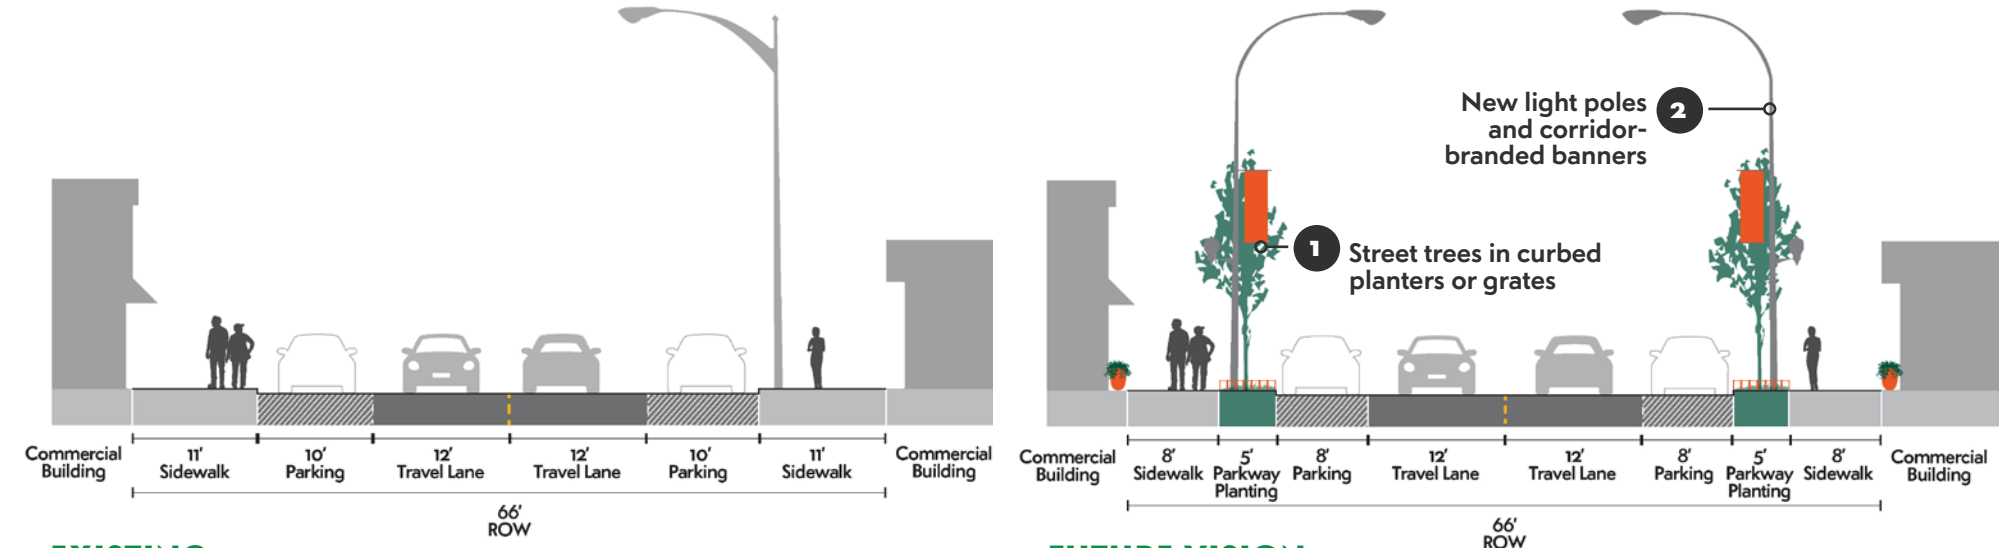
Typical residential Harlem Avenue corridor ROW typology
